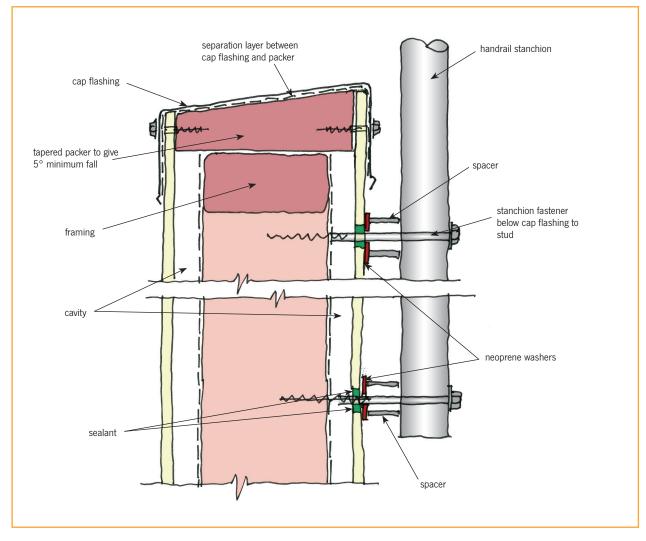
Attachment of stanchion for handrail to enclosed balustrade.
